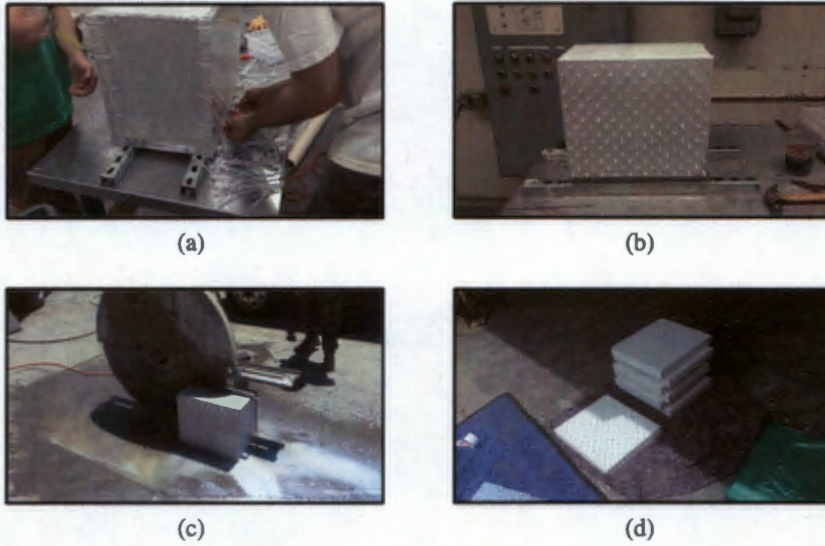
The acrylic panels of the formwork are removed and the concrete block is cut into separate panels.
